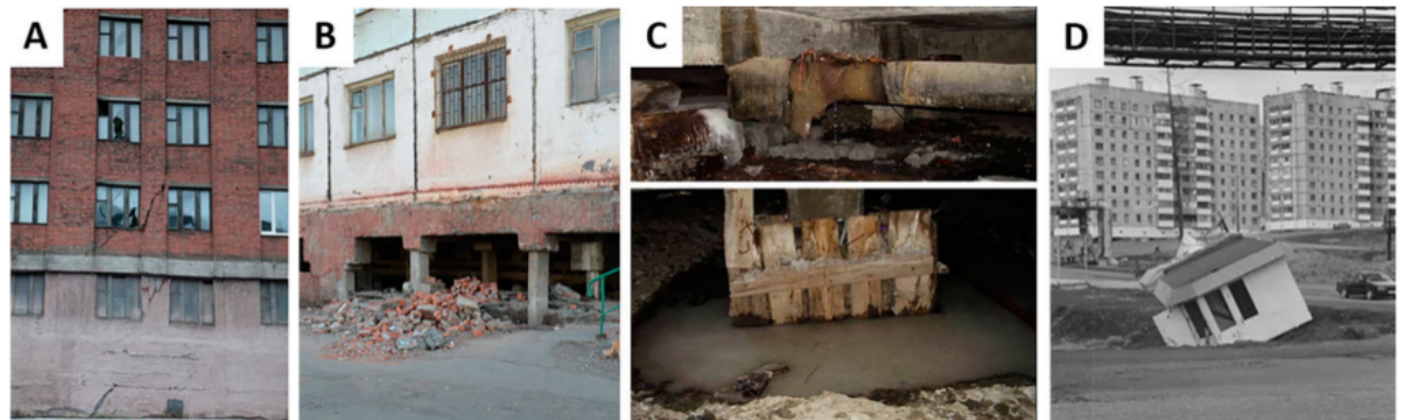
(a) Example of structural deformation of building caused by inadequate structural design exacerbated by permafrost warming. (b) Example of cryogenic weathering of the foundation. (c) Water leakage and accumulation around foundation piles. (d) Ground settlement developed under small heated kiosk due to permafrost degradation (Photographs by V.I. Grebenets and N.I. Shiklomanov). (Shiklomanov et al., 2017)
